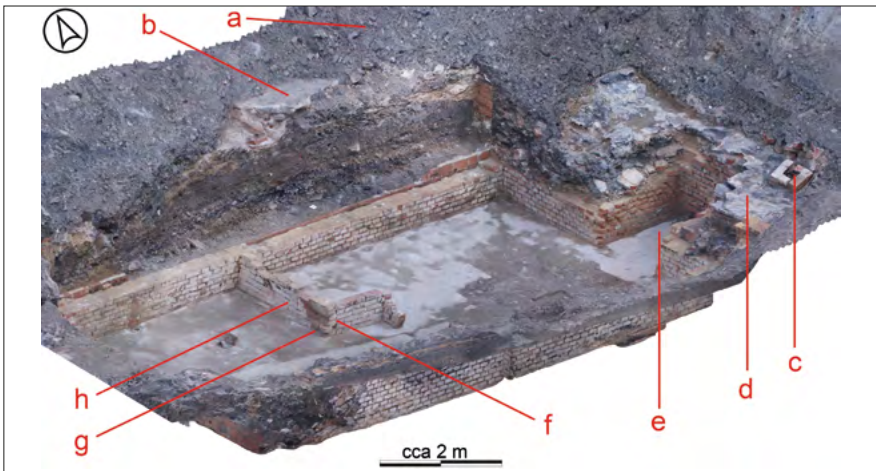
Axonometric view into the uncovered basement of the camp kitchen: a – overburden overlying the camp relics; b – concrete floor of the ground floor of the kitchen building; c – the building’s brick chimney taken down along with the roofing during the demolition of the building; d – dropped roofing asphalt; e – storage shaft extending to the surface of the yard outside the above-ground plan of the building; f – incorrectly executed masonry corner of the cellar partition; g – imprint of a wooden or iron staircase in the cellar paintwork; h – lime painted cellar paintwork, in which several penciled inscriptions have survived, perhaps related to the recording of stored goods.
